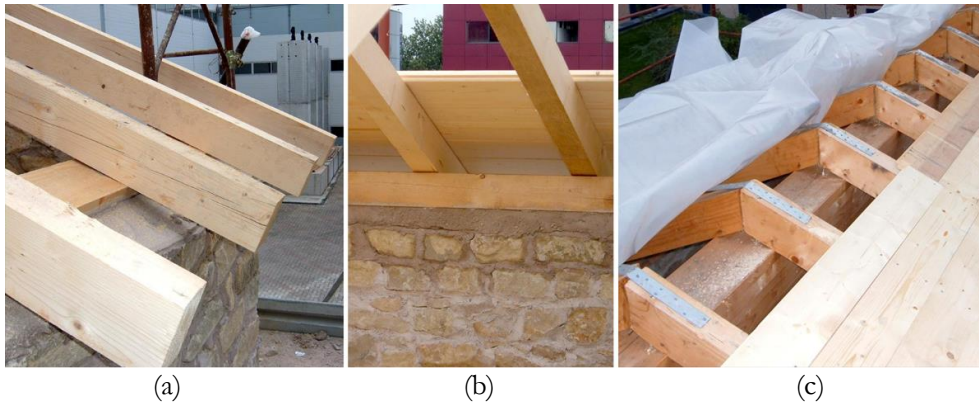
Timber roof: (a) rafters resting on the spreader beam above longitudinal walls; (b) inside view of the spreader beam, rafters, and nailed timber planks; (c) rafters supported by the ridge beam and connected by perforated steel plates.
